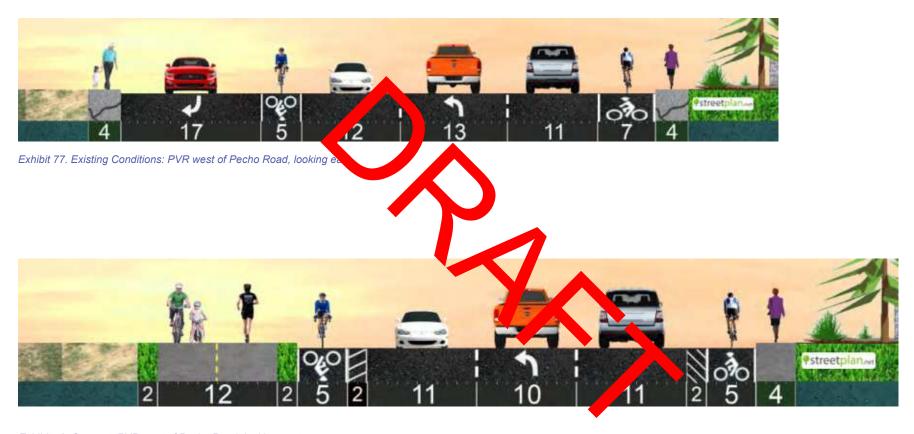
Concept: PVR west of Pecho Road, looking east
